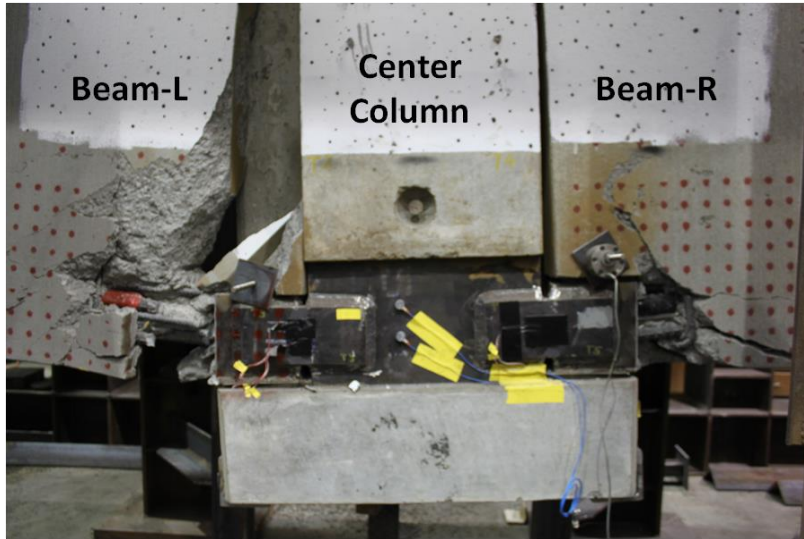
Elevation view, posttest damage of the spandrel beam at the bottom connections to the center column
